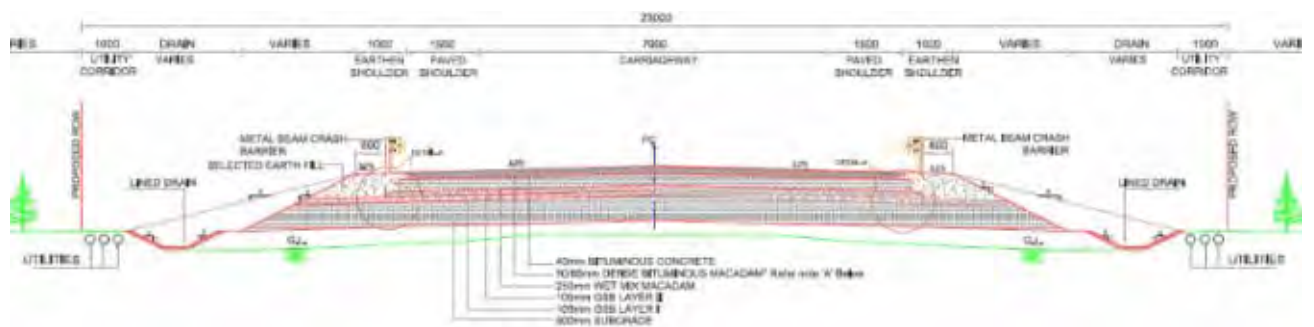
C4-R – N Two Lane Carriageway with Paved Shoulder in Rural Area (New Construction)
